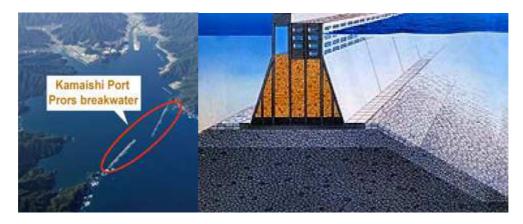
Plan view and impression of Kamaishi Breakwater in Japan
